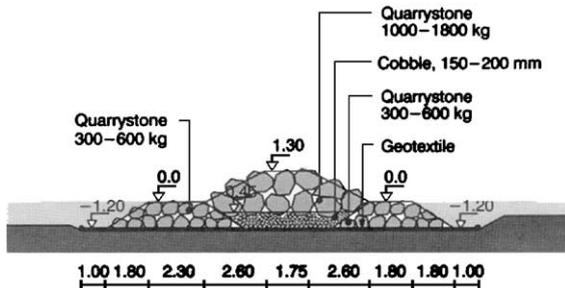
Cross-section of breakwaters at Lønstrup. From Lastrup and Madsen (1994).
